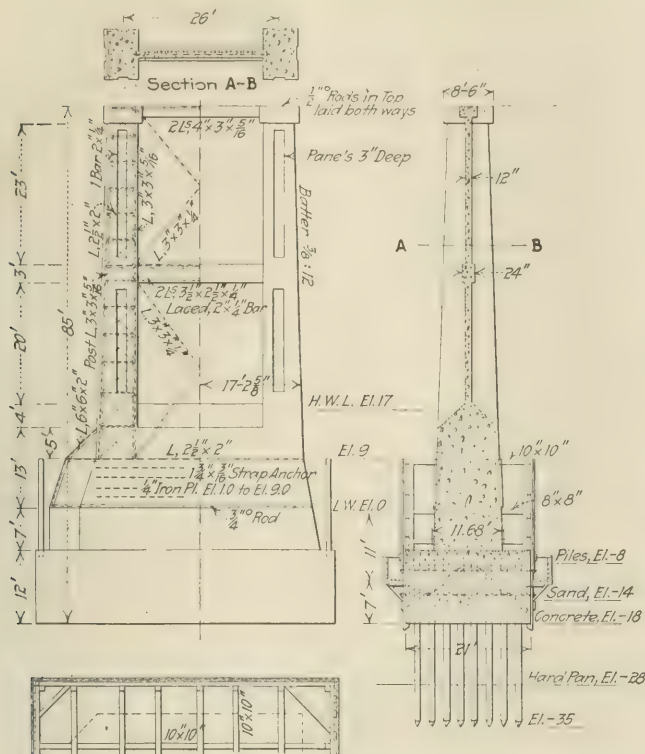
PIER FOR THE CHANNEL SPAN OF BURLINGTON BRIDGE
